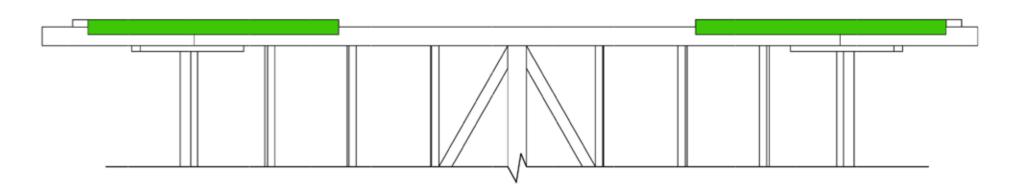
1:20 post -fire measured survey - Horizontal rafter wall ties (M) indicated in dome wall interior elevation (2020) © SLHA
